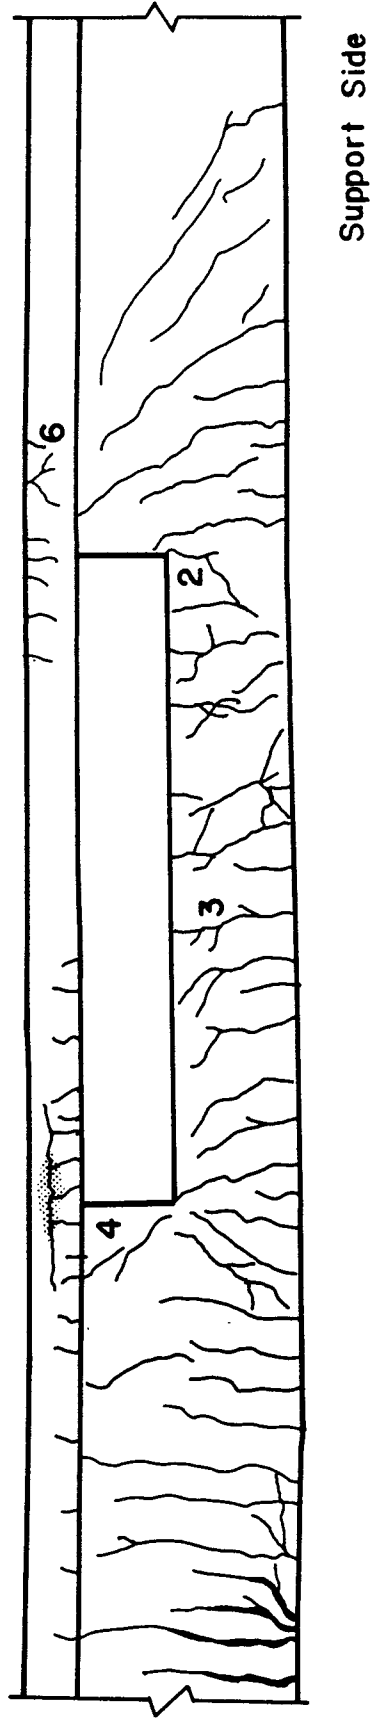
Crack Pattern - BEAM D1.
